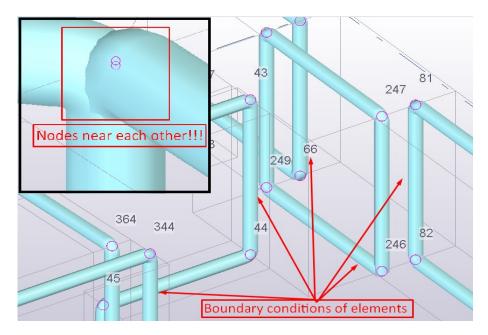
A detailed representation of warnings/errors of the analytical model created in the case of structural concrete walls and columns of this project.
